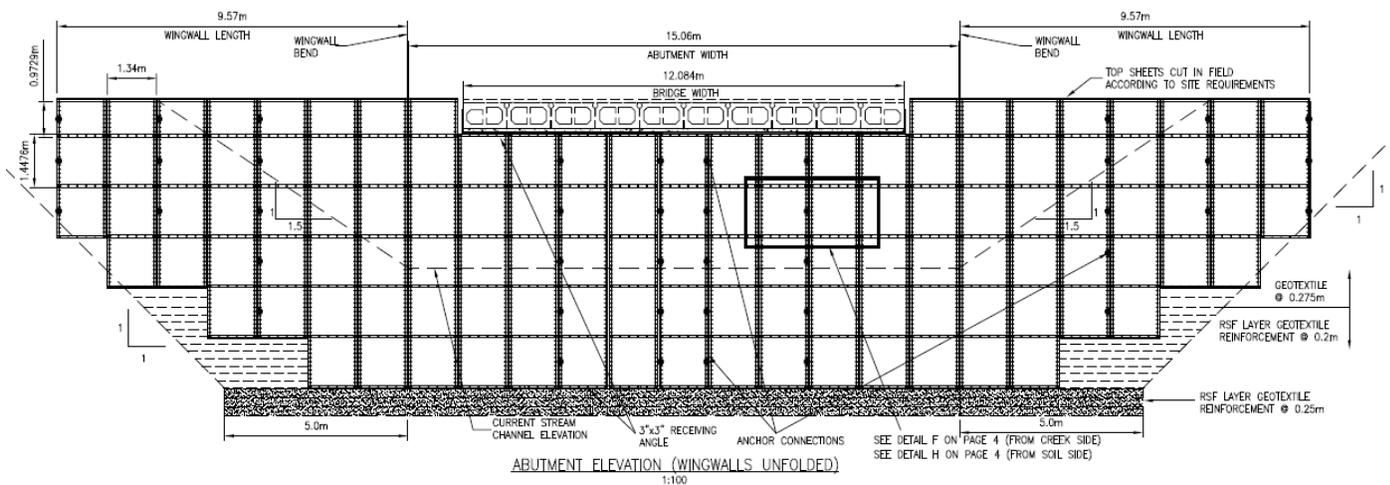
Approved Alternate Corrugated Aluminum Sheeting Wall Design, Section, Wall Layout
